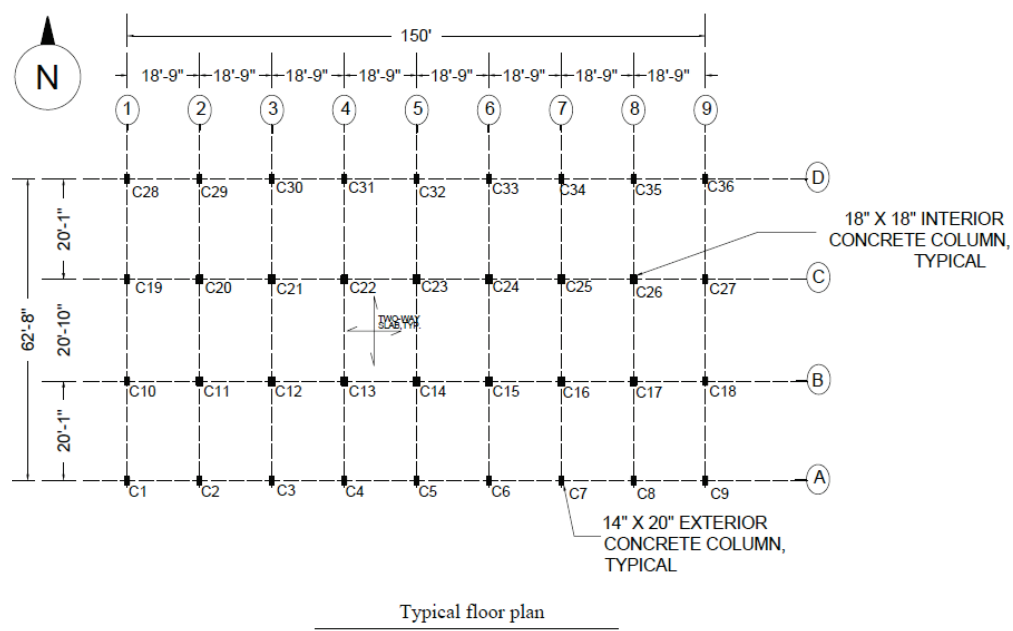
Typical floor plan (source: original drawings by Rissman and Rissman Associates).
